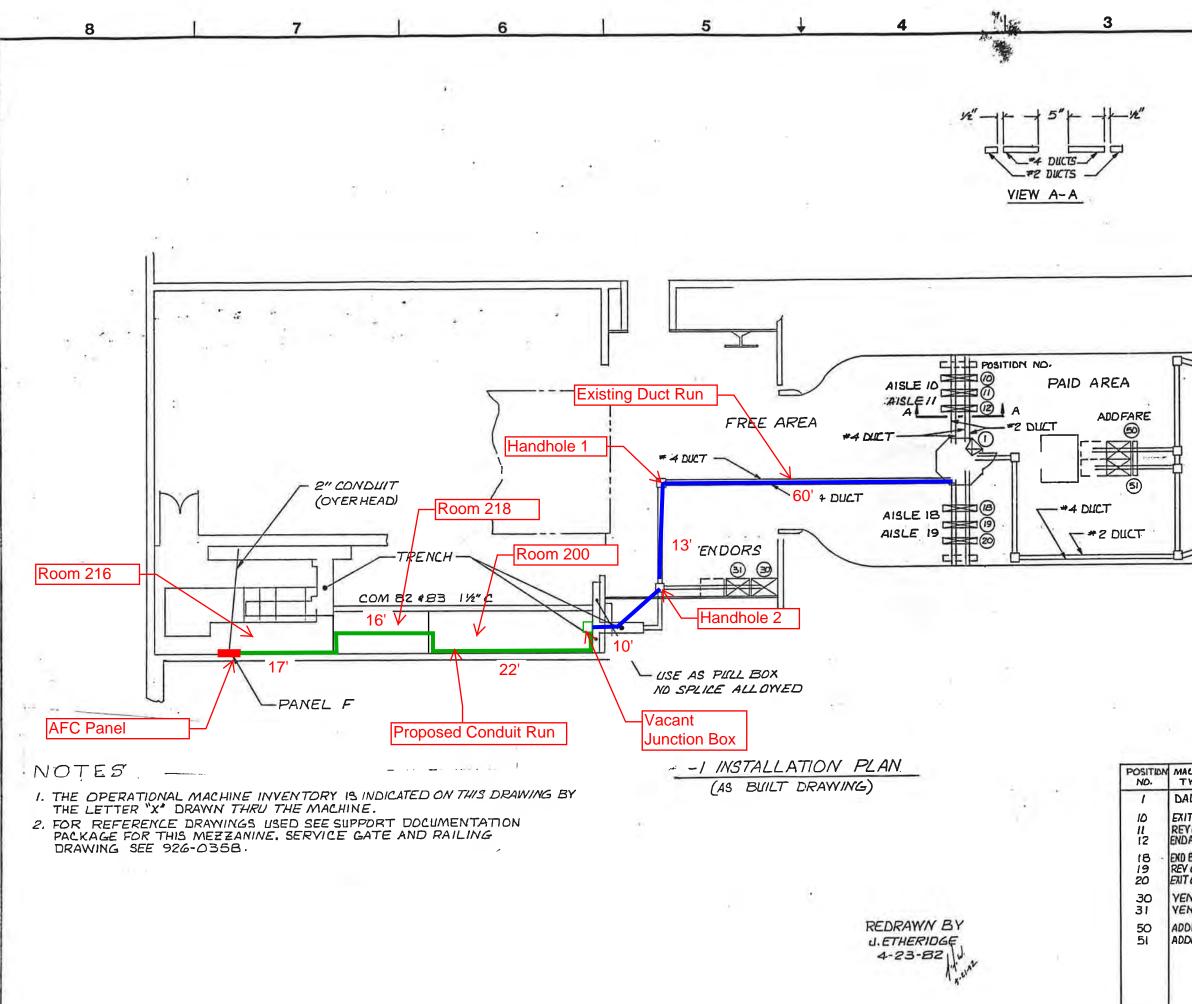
A05 Cleveland Park: Electrical Room #216, proposed conduit run along right side of wall between AFC Panel and Battery Room #218
